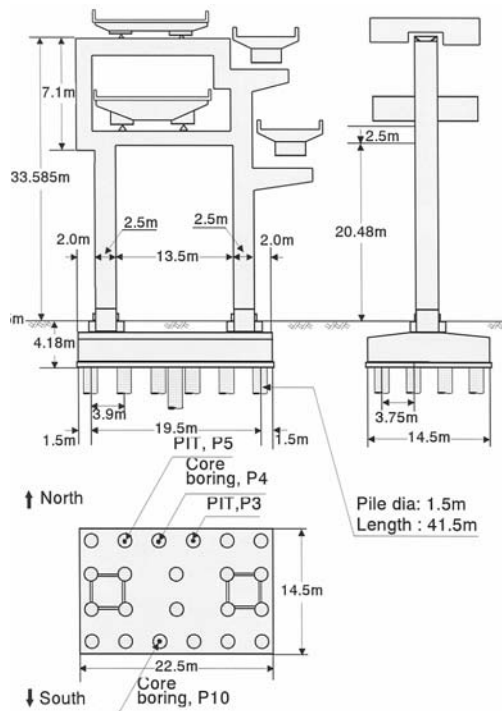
Cross sections of Uozakihama Pier 211 and plan view of its foundation (Hanshin Highway Authority, 1996)
